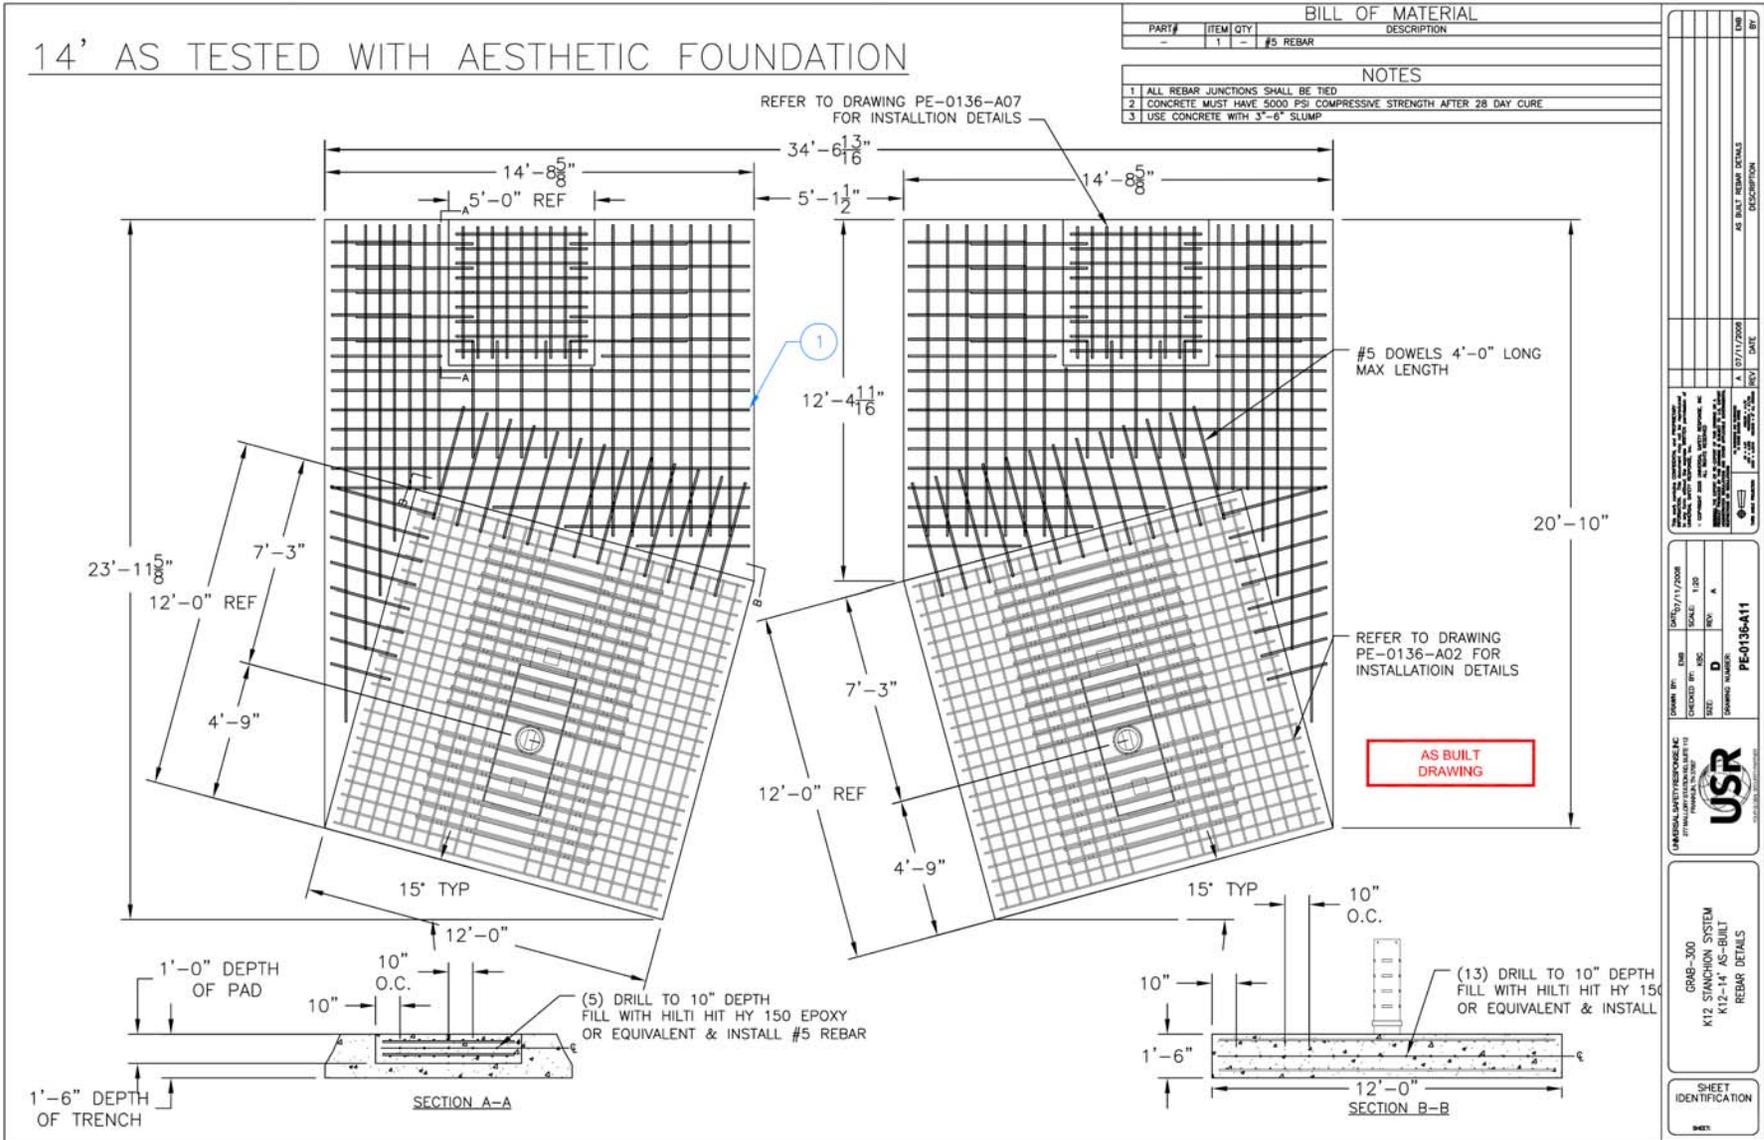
Details of the GRAB-300 14-ft barrier net – stanchion system rebar details.
